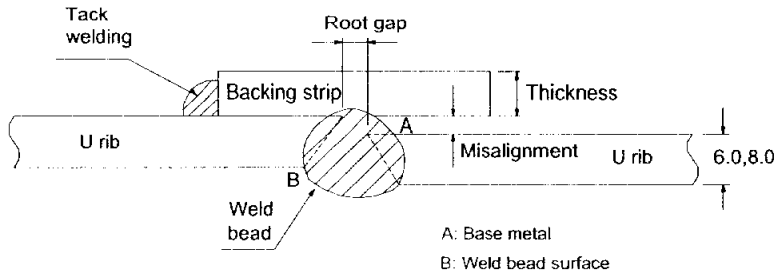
Cross Section of Welded Joint with Backing Strip
